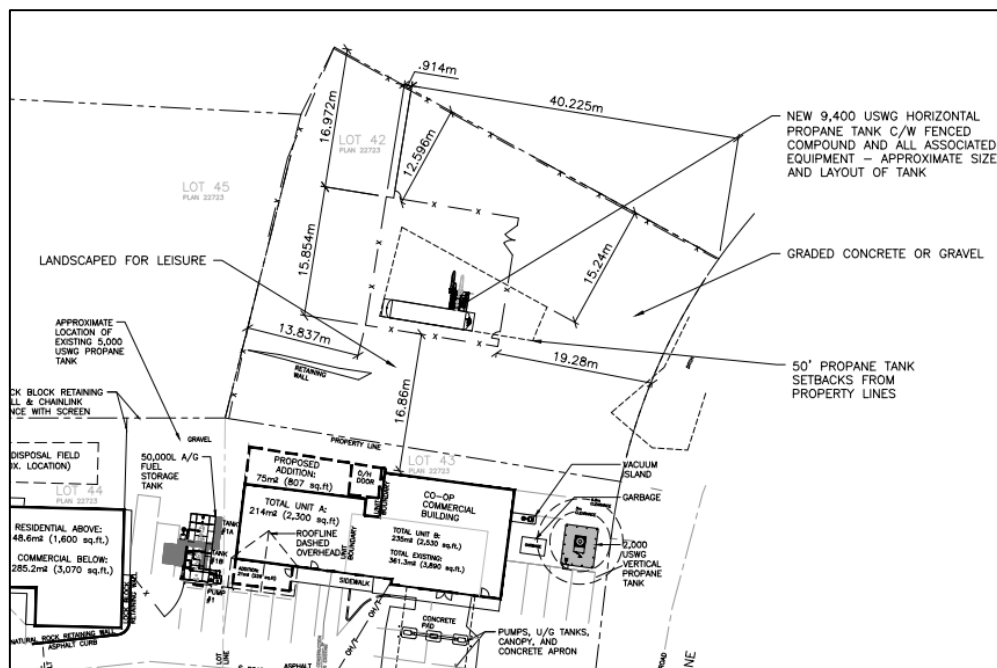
Proposed Site Plan – 793 Lockinvar Lane, Gabriola Island
